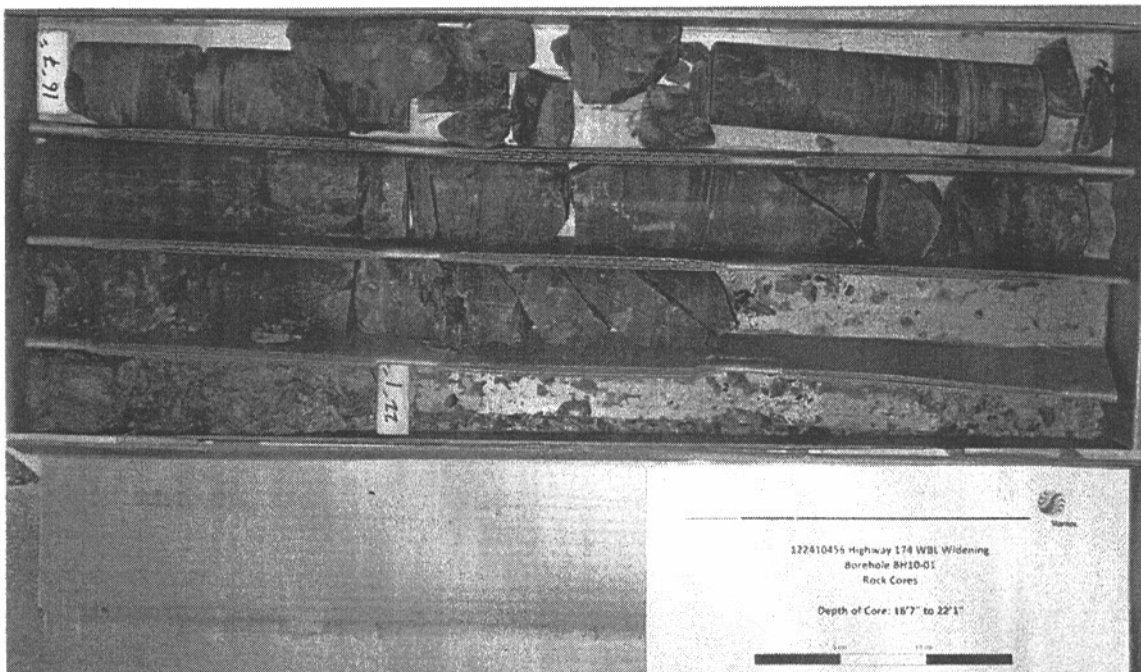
Bedrock core from borehole BH10-01 (5.1 m to 6.7 m)
